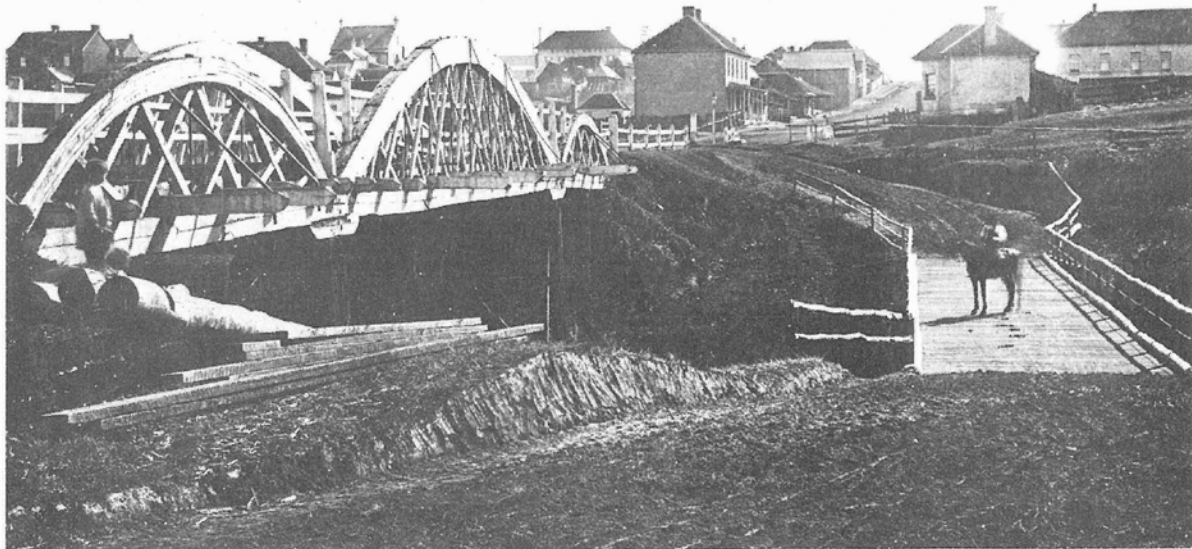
The laminated timber arch bridge over South Creek at Windsor in 1872
